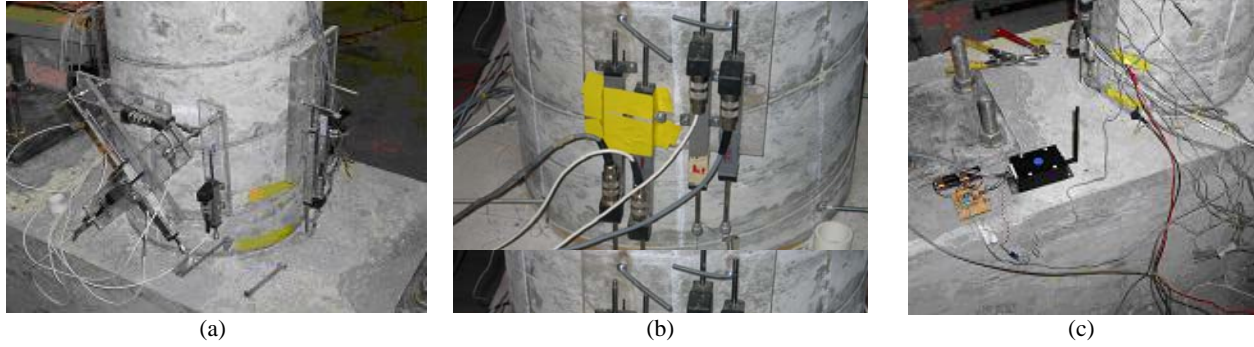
(a) LVDTs instrumentation at the pier base, (b) two LVDT pairs mounted to the front and back pier faces, and (c) a wireless sensing unit mounted to the top of the concrete support pedestal
